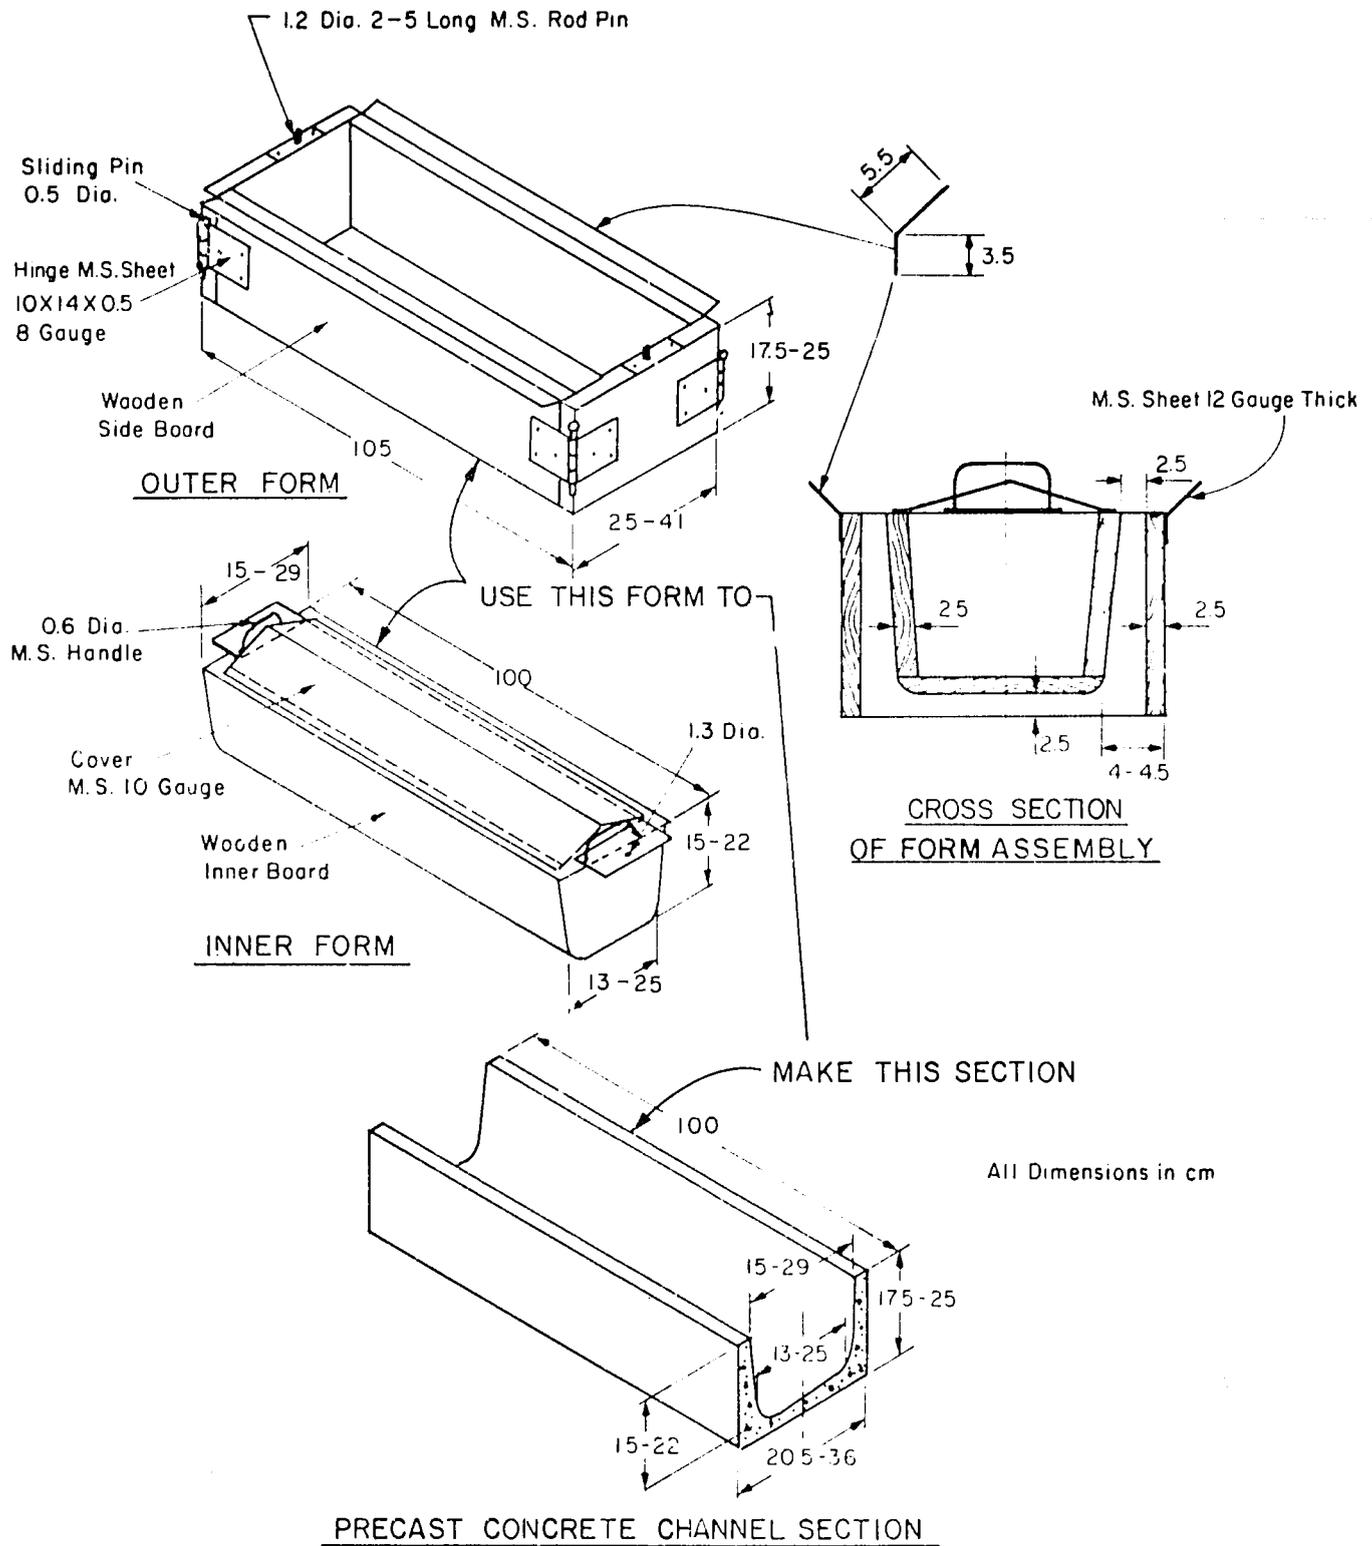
Precast concrete channel sections. Wooden forms used for casting (22).
